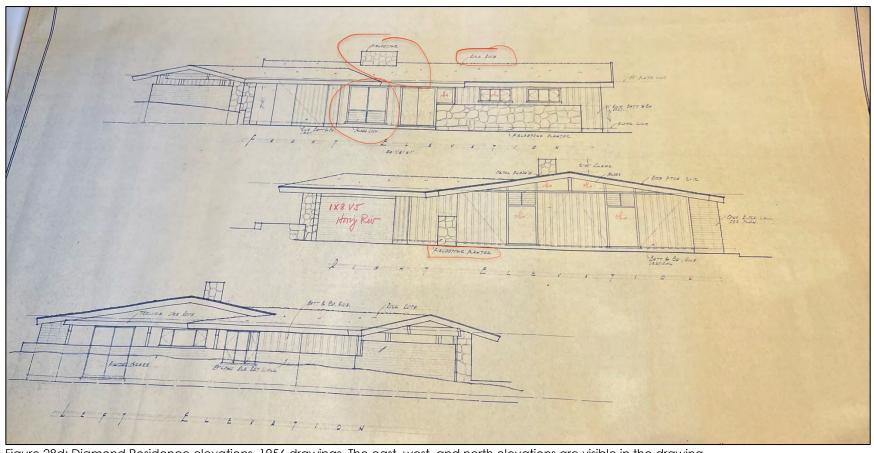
Diamond Residence elevations, 1956 drawings. The east, west, and north elevations are visible in the drawing.
